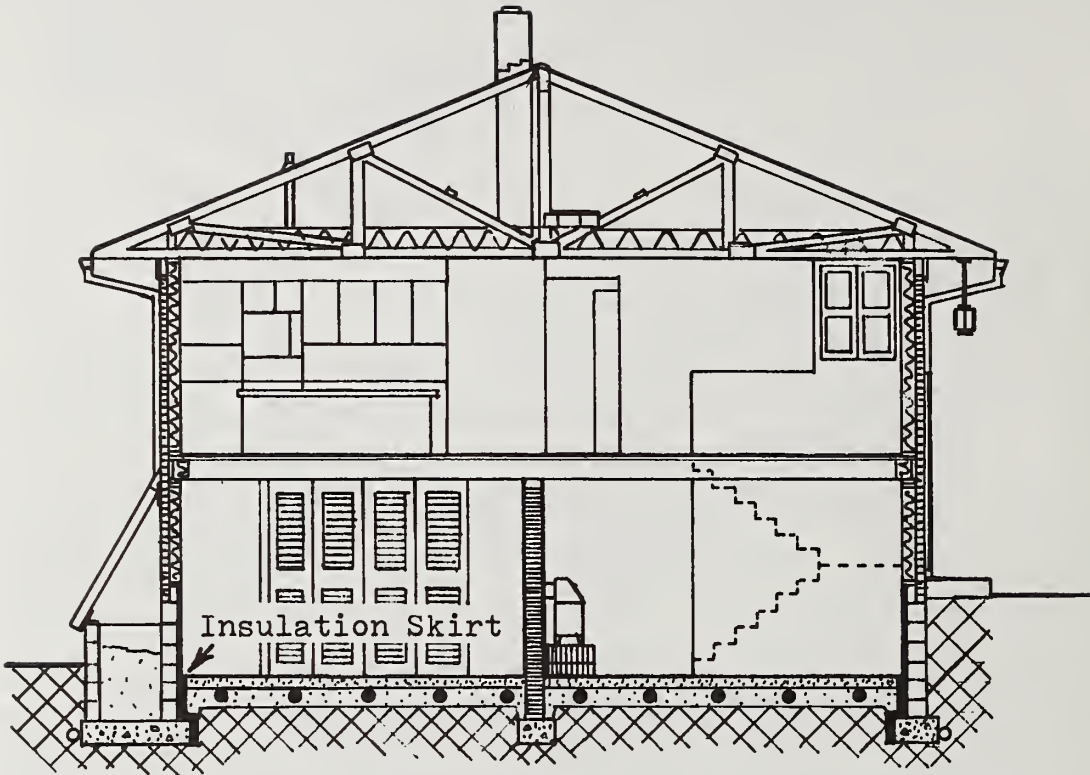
Cross-Sectional Construction of Split Foyer Design
